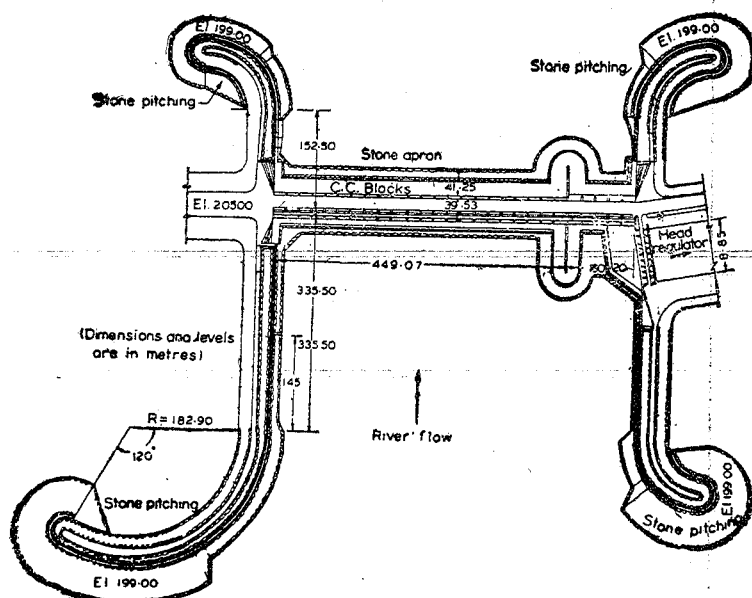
(c) Layout Plan of New Okhla Barrage at New Delhi on Yamuna river.
